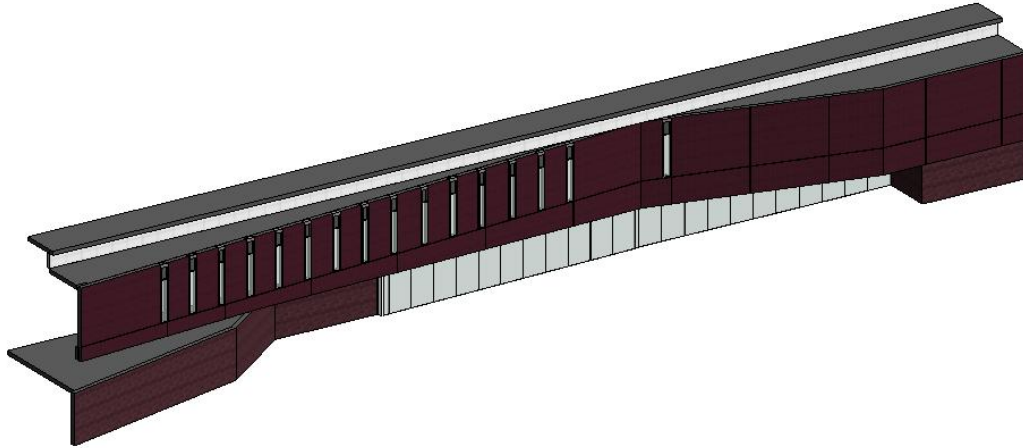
Original North Facade with Expansion Joints and Brick Angles
